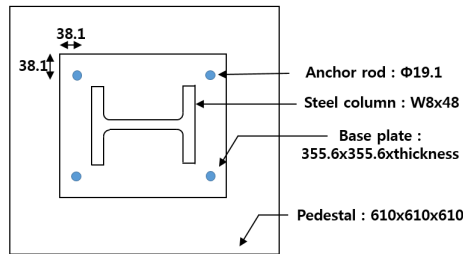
Plan of steel column-base plate connection in Gomez et al.(2010)
